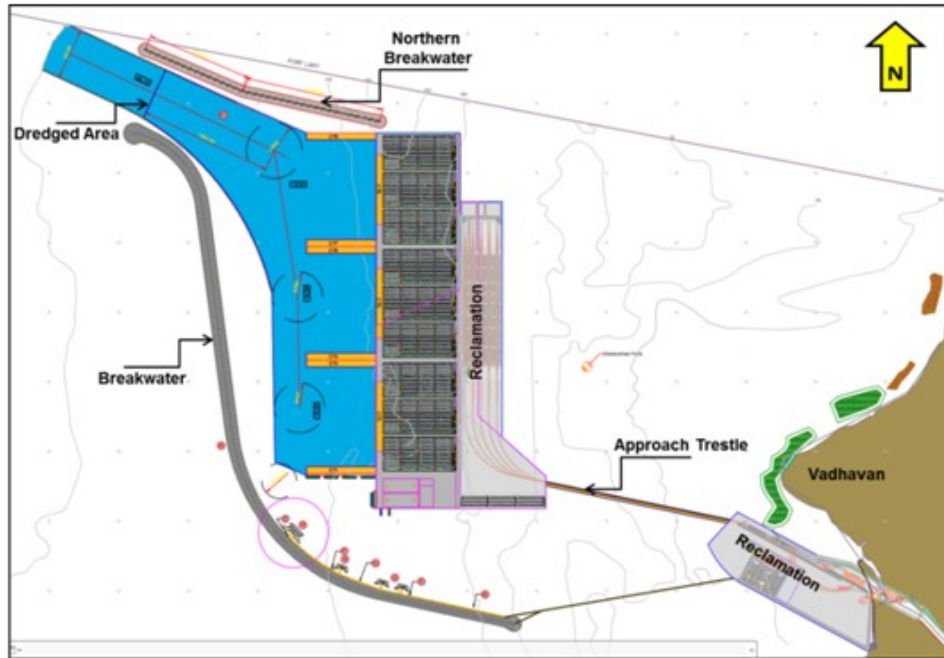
A: Proposed Modified Master Plan Layout at Vadhvan with North Breakwater
